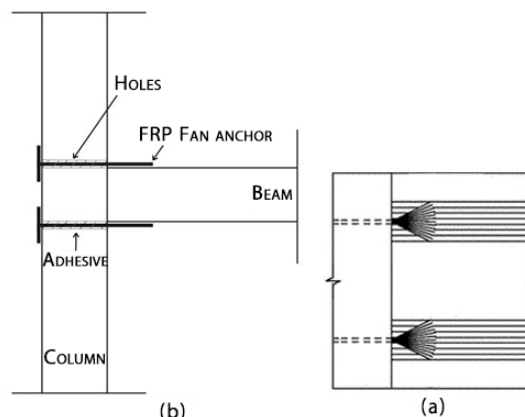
schematic figure of retrofitting by FRP anchors: a) beam elevation, b) joint section
